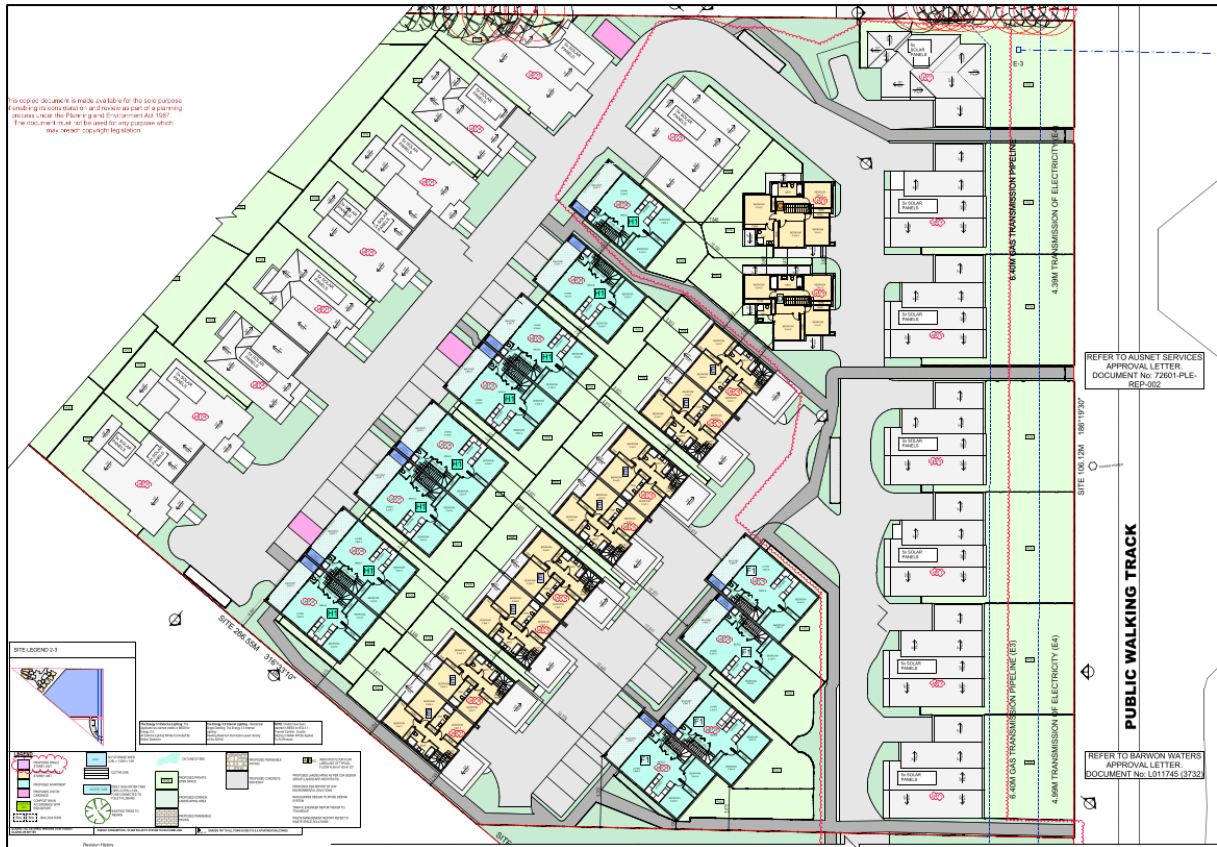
Part site and upper floor layout of dwellings accessed from the upper entrance to the site from Basin Rise. Upper floor plans for Units 43 to 50 (inclusive) are shown at Figure 26 later. Source: Application documents.
